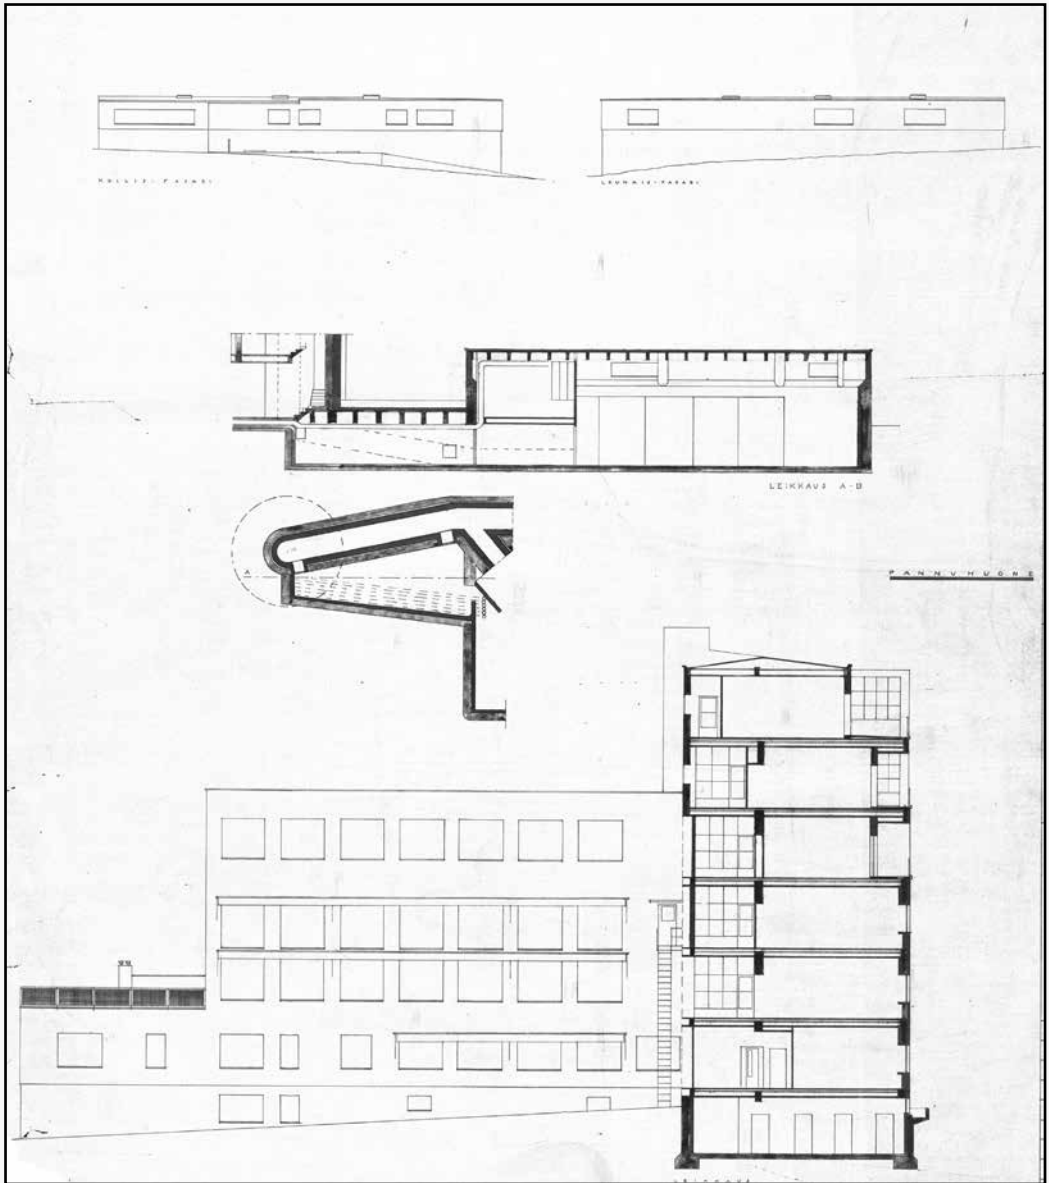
Master drawing of the façades and section of the district power station, and the B wing south façade, April 1930. Drawing No. 50-102a. The drawing has been edited. AAM.
